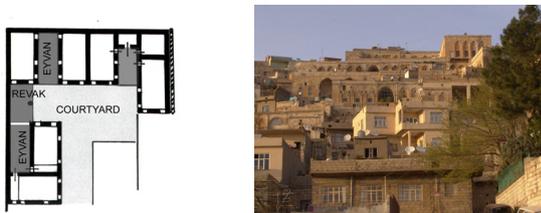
Drawing[10] and photo the house at 110 street no:8 in Mardin.
